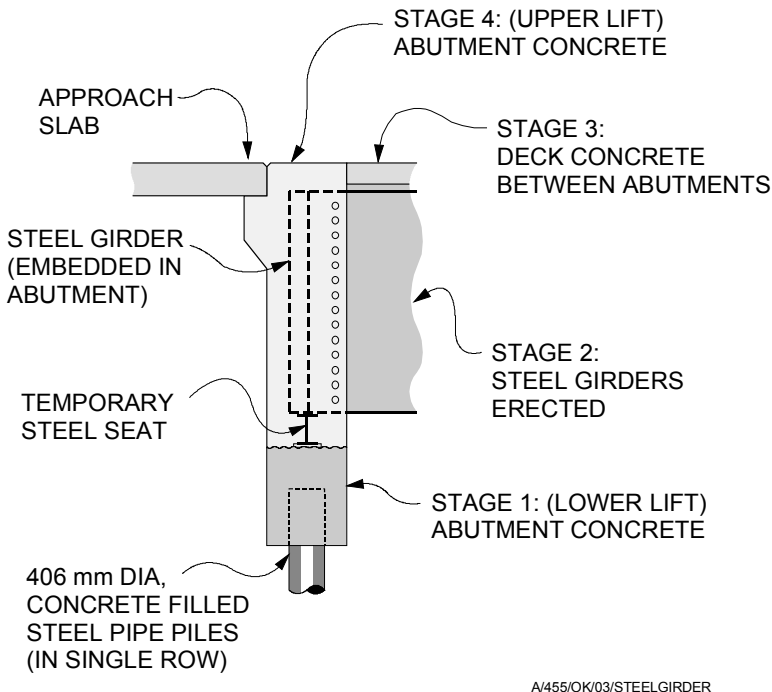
Typical cross section and construction sequence of steel girder bridge abutment in Vancouver Island Highway Project (Harvey et al 2001).
